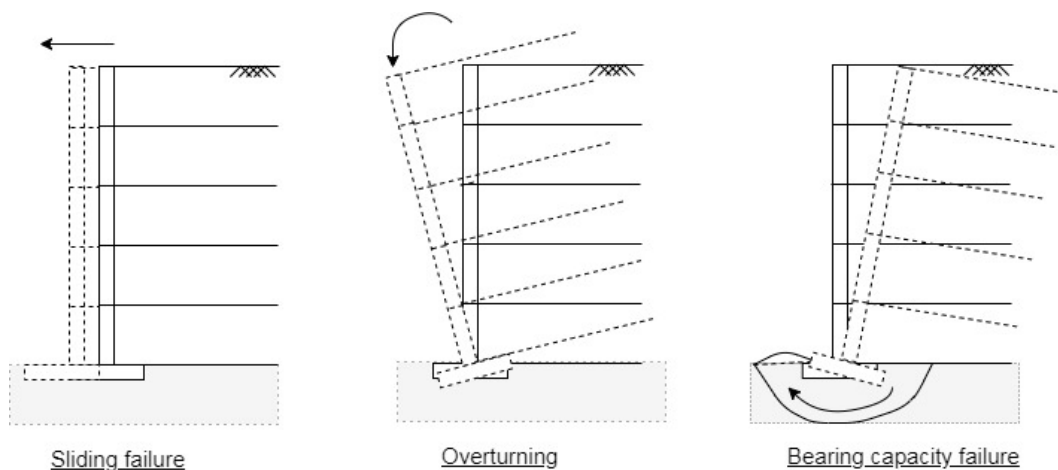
Modes of external failure of a reinforced soil abutment
